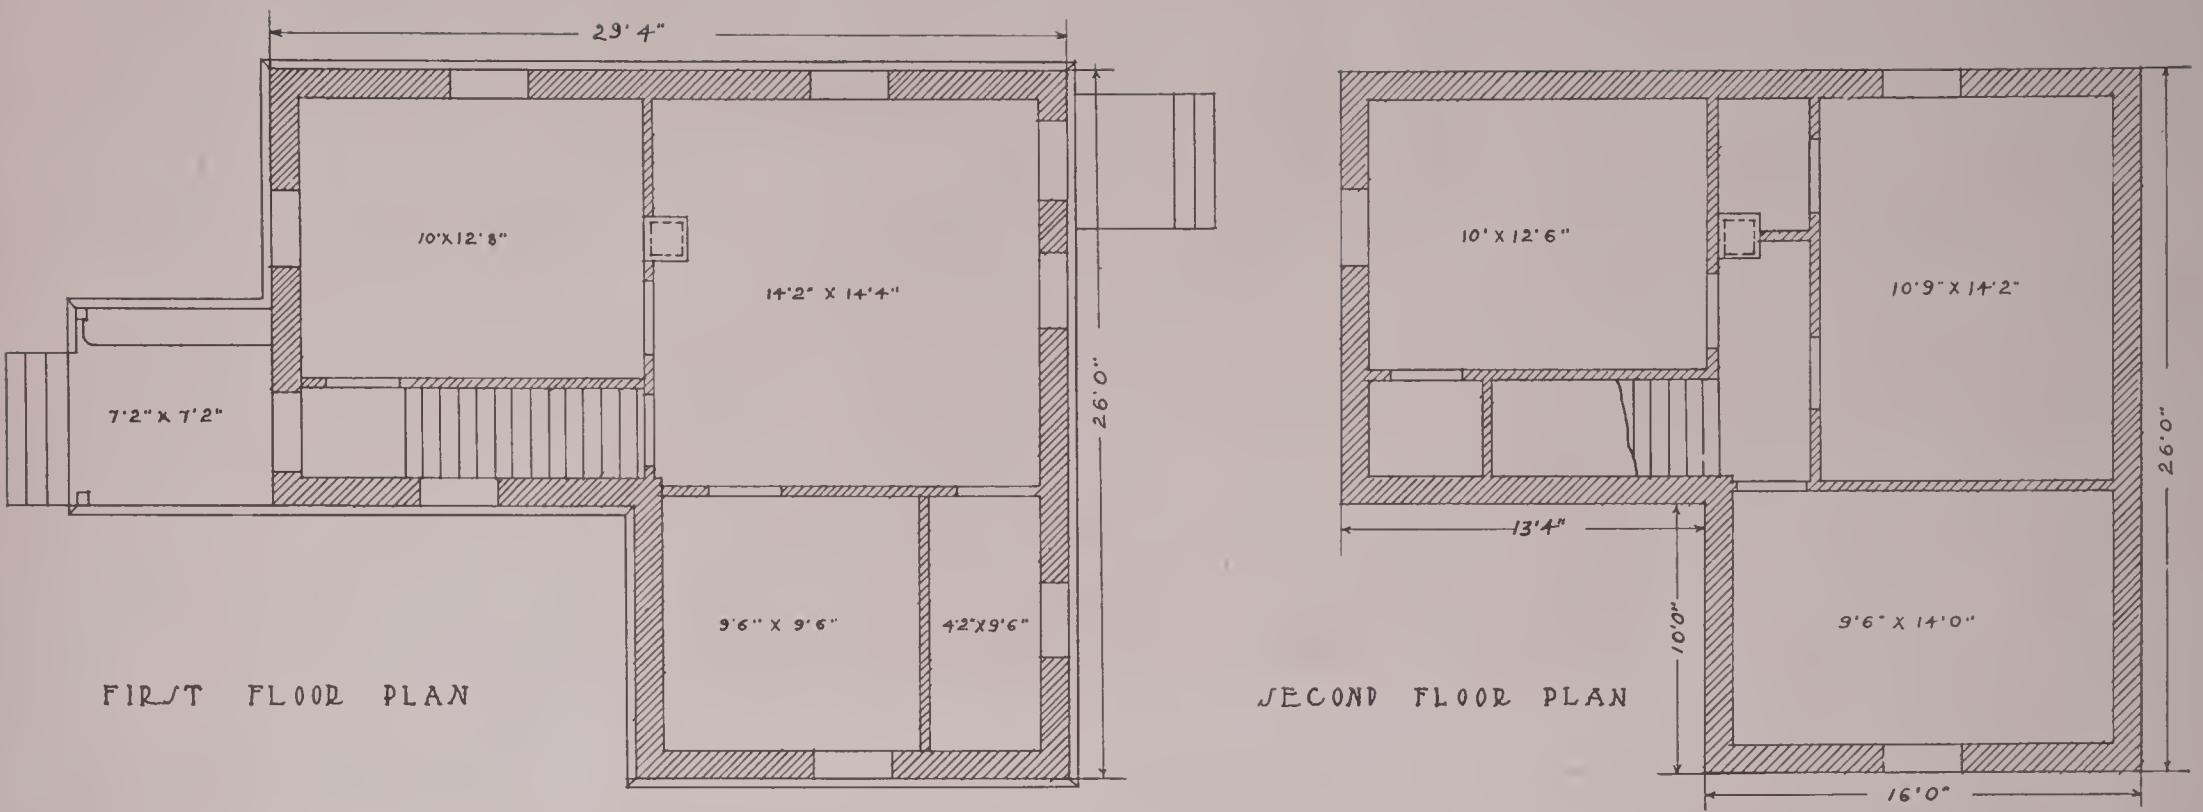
PLATE VIIIA.—Floor plans of concrete house erected at Mineville, N. Y. by Witherbee, Sherman & Co. Cost, \$1,025.00.
